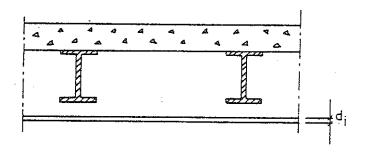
Floor structure, composed of a reinforced concrete slab, load-bearing steel beams, and an insulating ceiling
